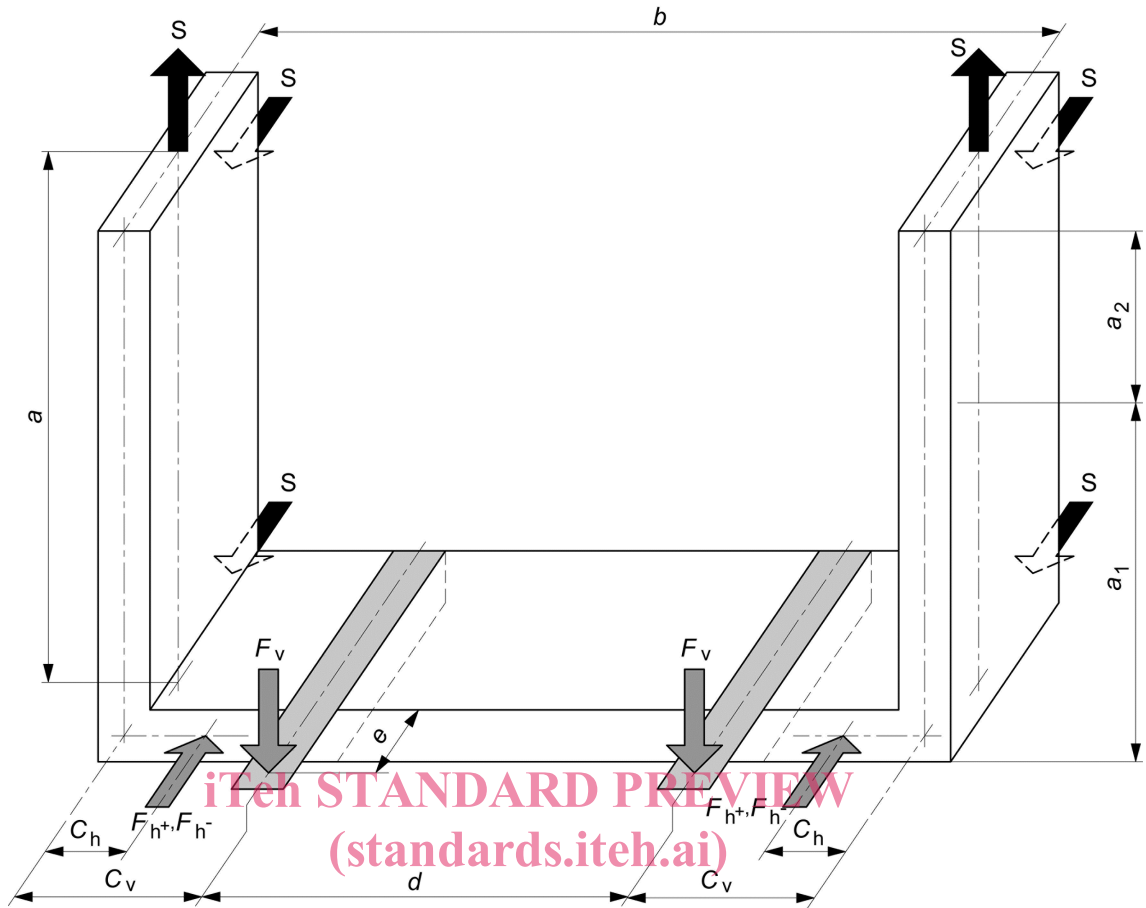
Schematic L-connection and loading points (any connection method can be chosen)
